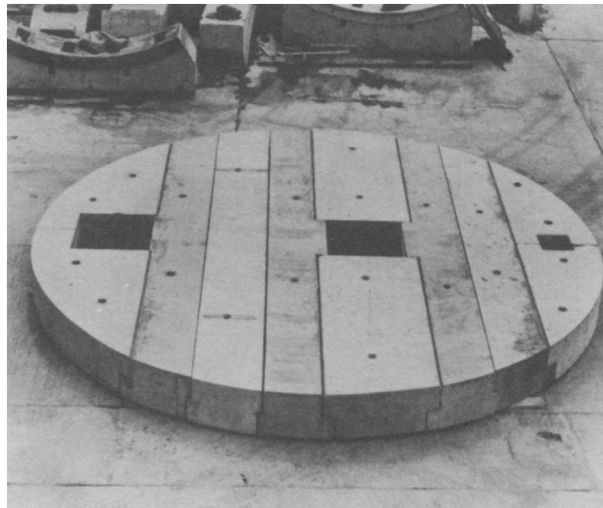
Cover slab to suit a 7.62m I.D. Shaft.
